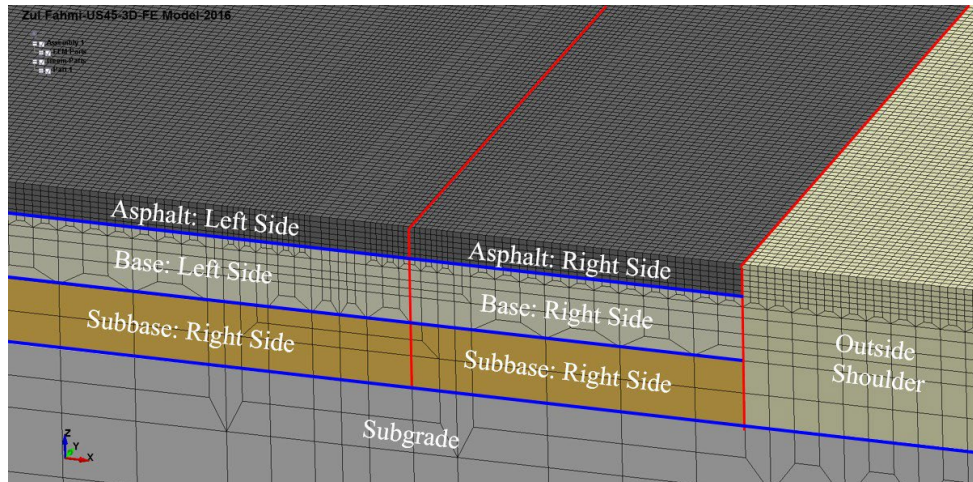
Pavement-subgrade 3D-FE model of uncracked pavement developed
